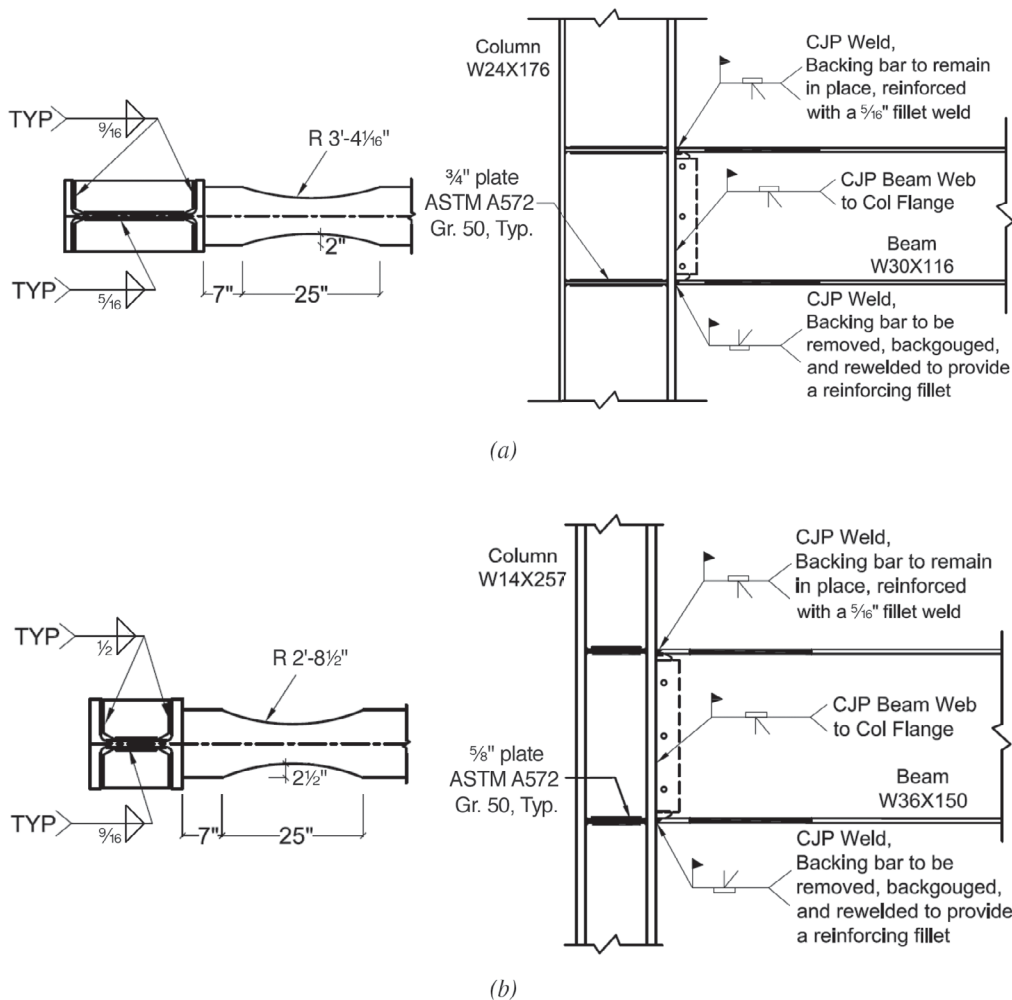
RBS connection details: (a) specimen C1; (b) specimen C2.
